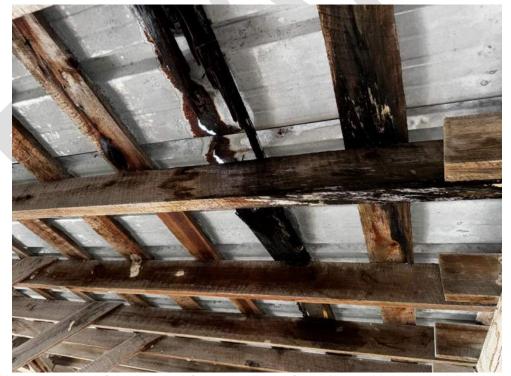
View of damaged roof wood purlins, rafters, diagonal bracing and metaldeck.
